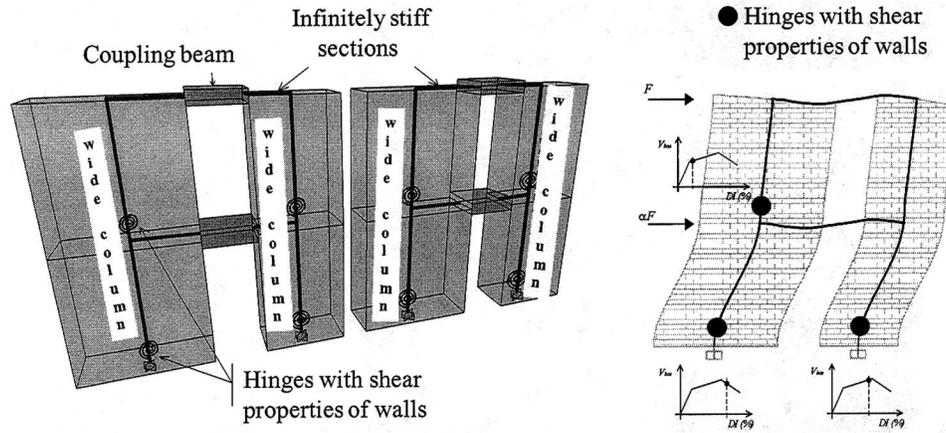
Modified wide-column model for Specimen 3-D: a) Nonlinear model, and b) damage assessment.
